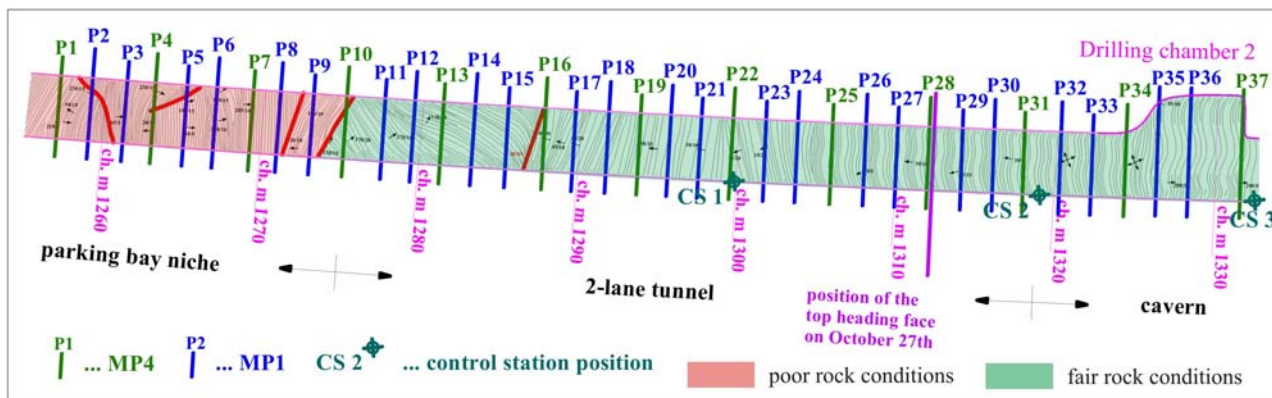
Disposition of the measuring cross sections and control station positions in the right tube of the exploratory tunnel with lined geological layout.
